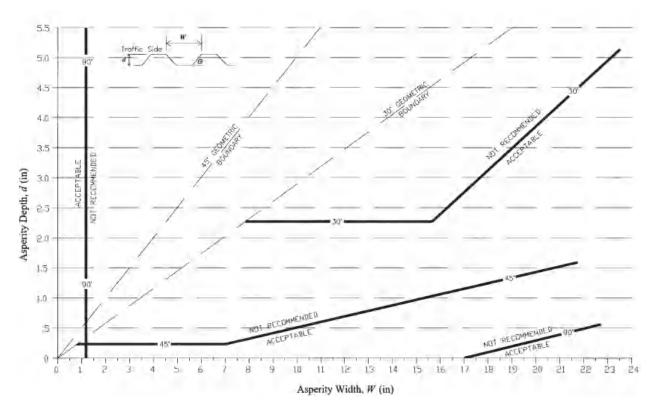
Final Design Guidelines for Aesthetic Surface Treatments of Safety Shape Concrete Barrier [1]
